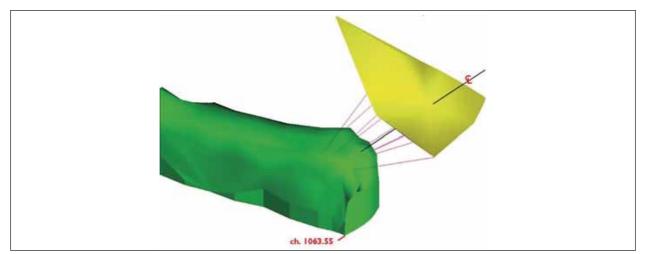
Intake Tunnel - 3D image of actual executed exploratory drilling from ch. 1063. (Illustration: AFS Pihl)
